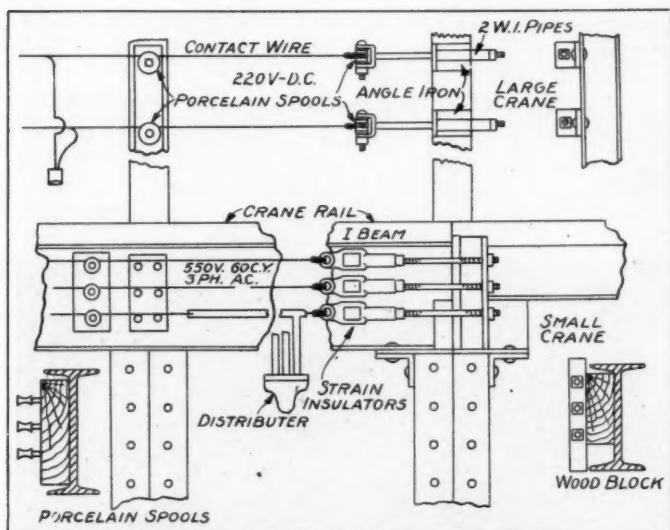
METHOD OF SECURING AND SUPPORTING TROLLEY WIRES ON CRANE RUNWAY
